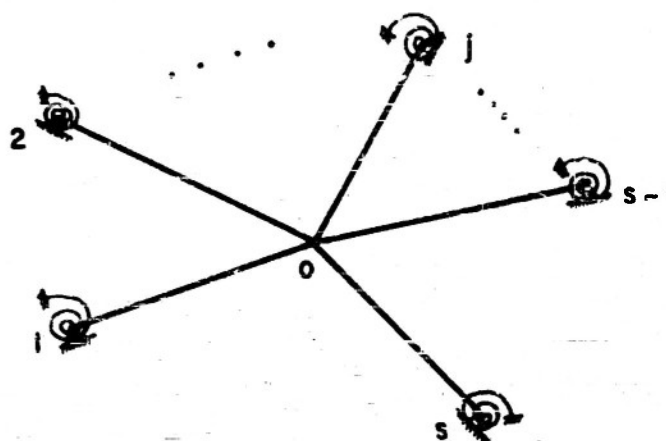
TYPICAL JOINT OF A PLANE RIGID FRAME, NO SIDESWAY
